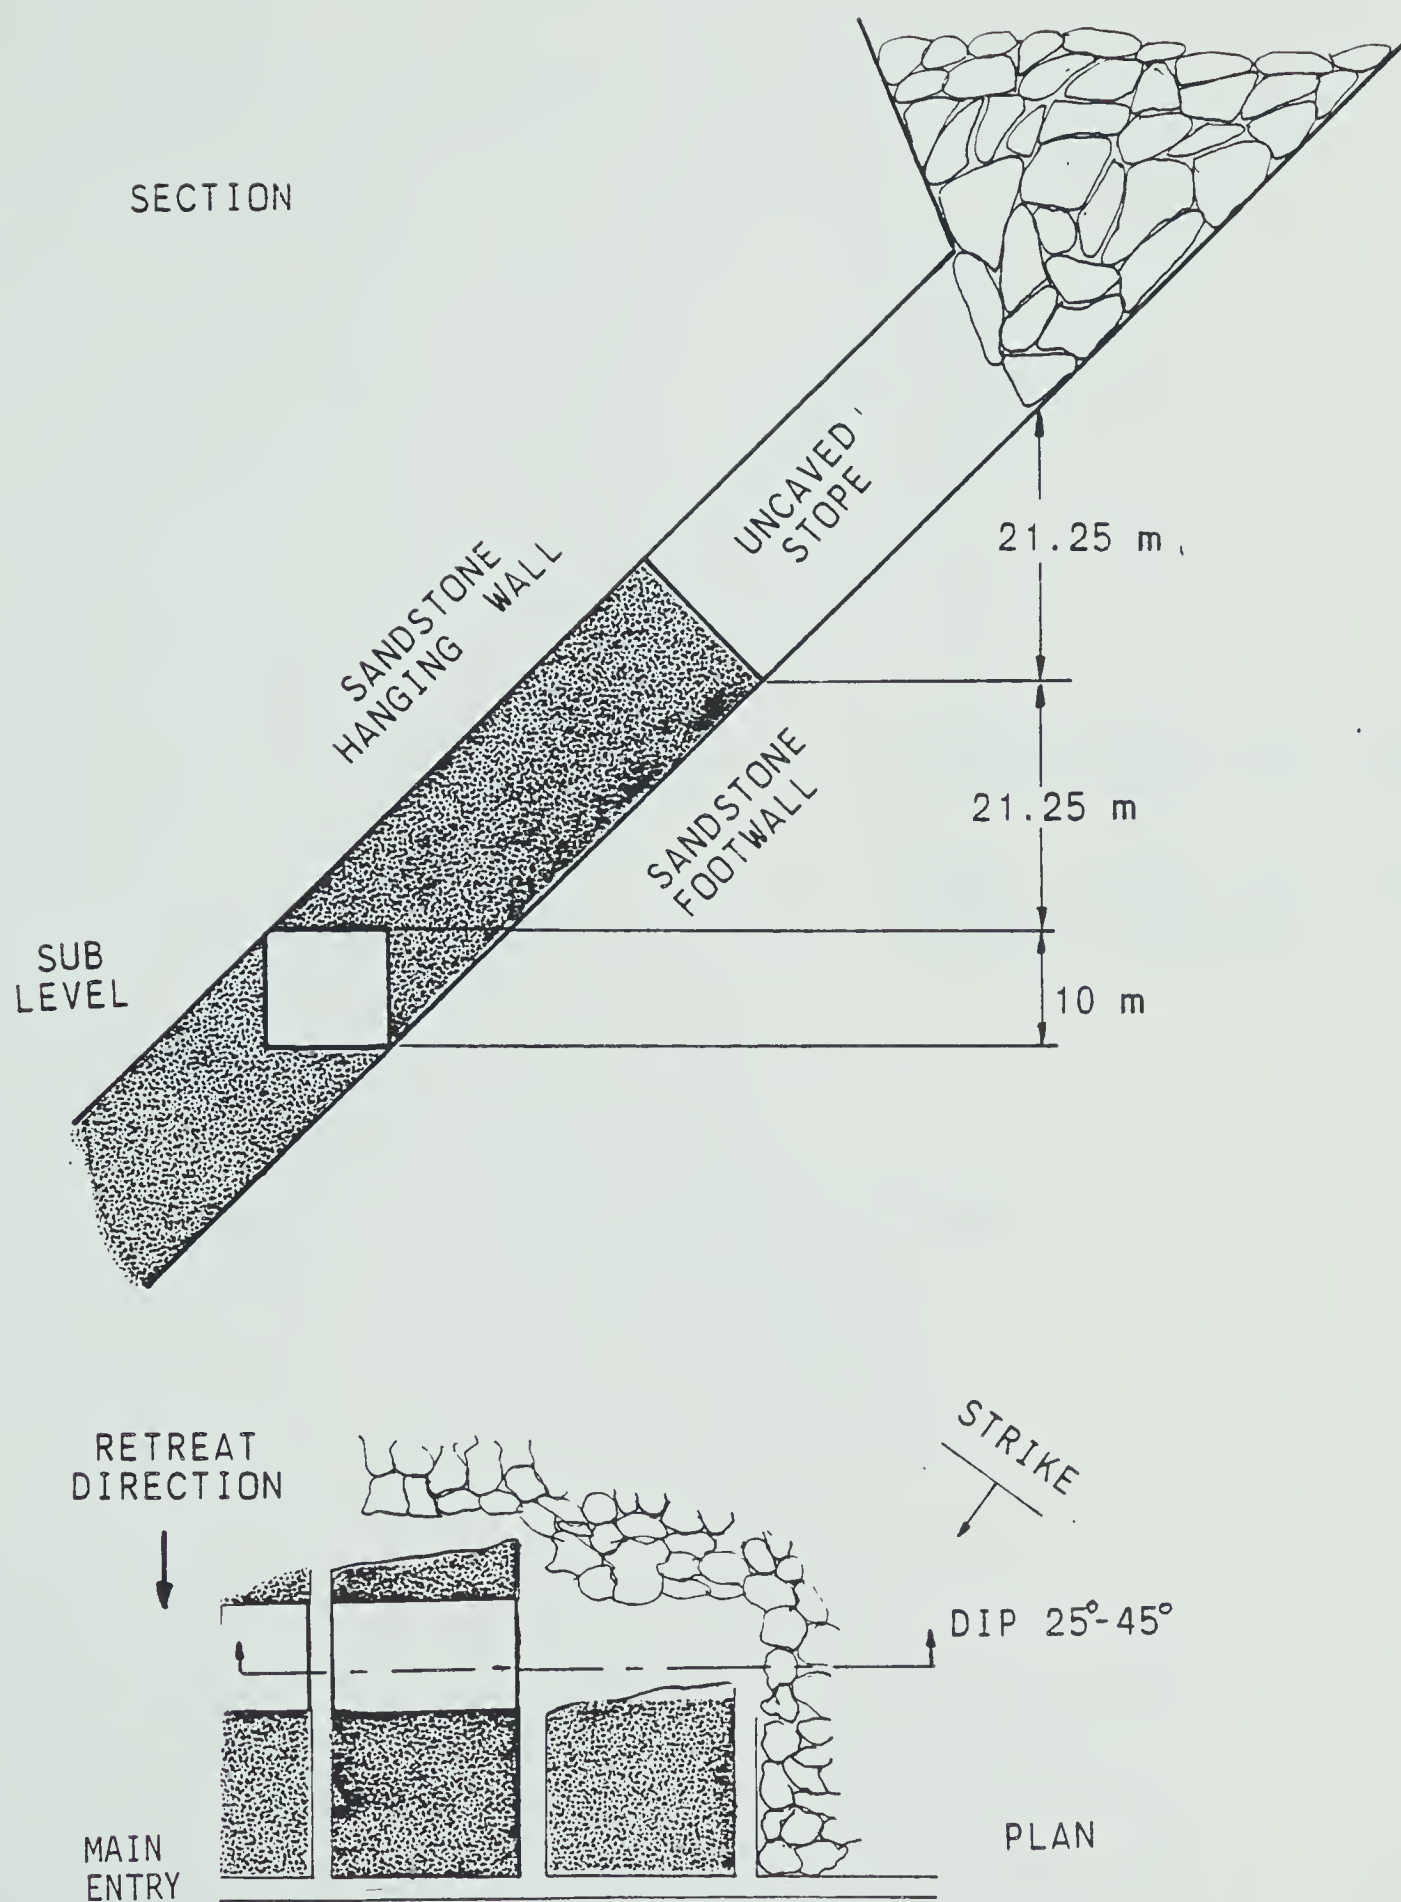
PLAN AND SECTION OF CONFIGURATION 1
